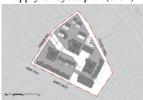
YoungA Apt. Housing Redevelopment Maintenance business layout plan
